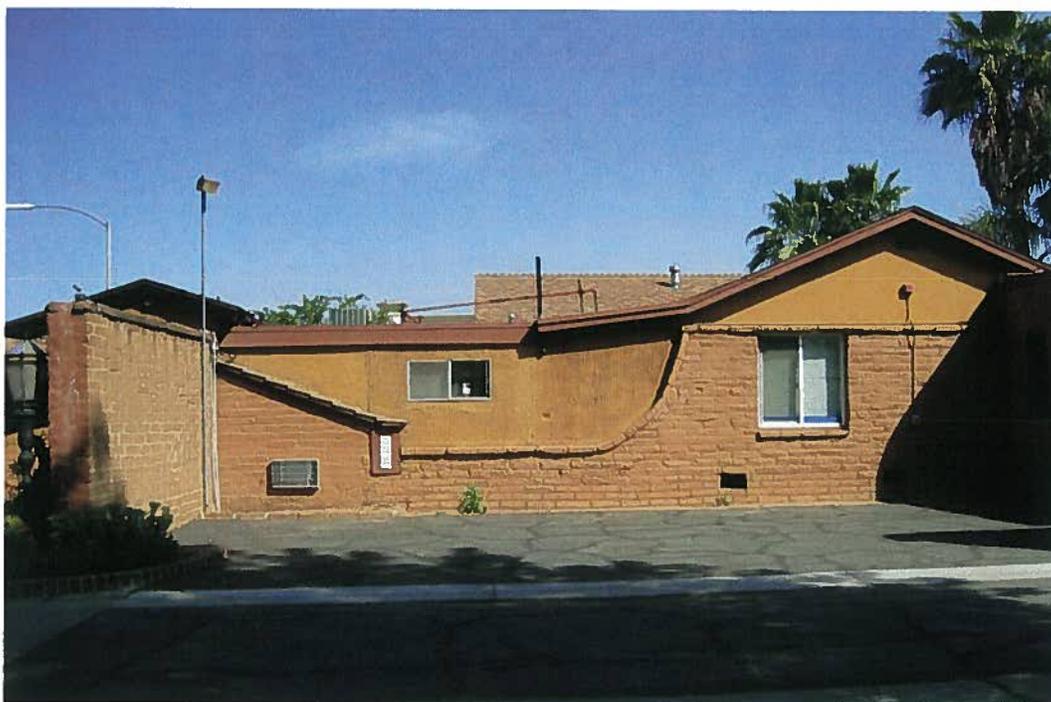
Portion of the original residence at the south façade with vinyl replacement windows. The center was infilled and differentiated with a vertical textured stucco exterior finish. The adobe cladding along the original smooth exterior may have been added with the 1960 rear office addition.
